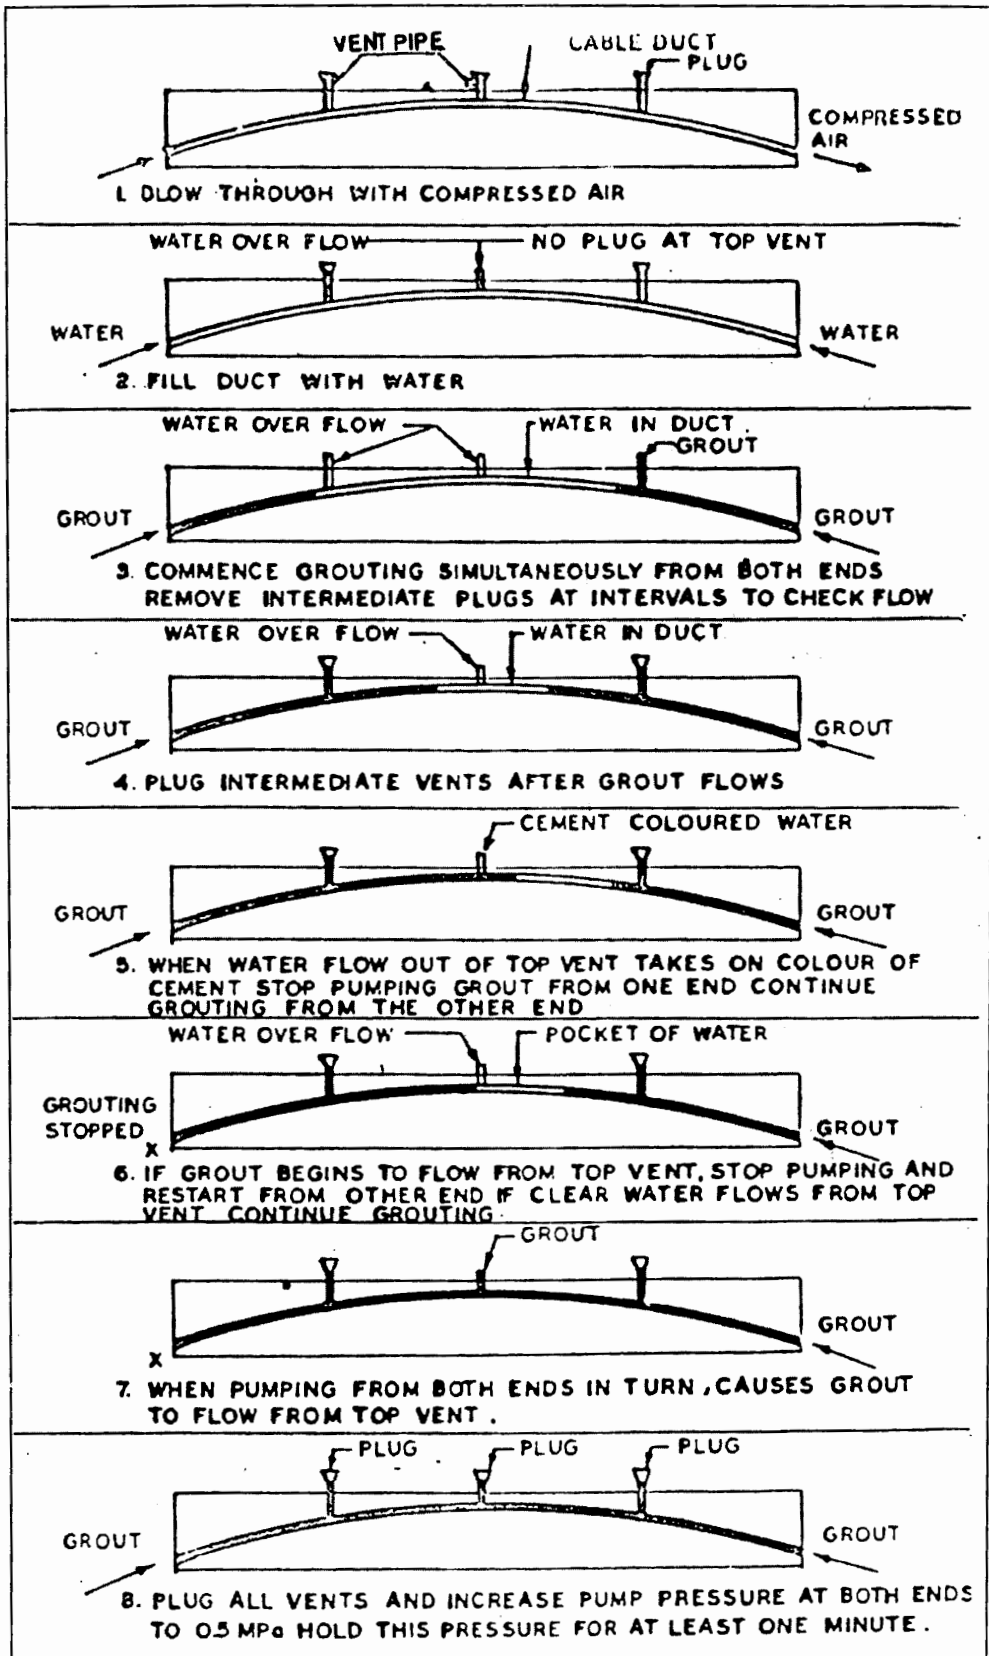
/III : Procedure for Grouting of Cables Draped Downwards
